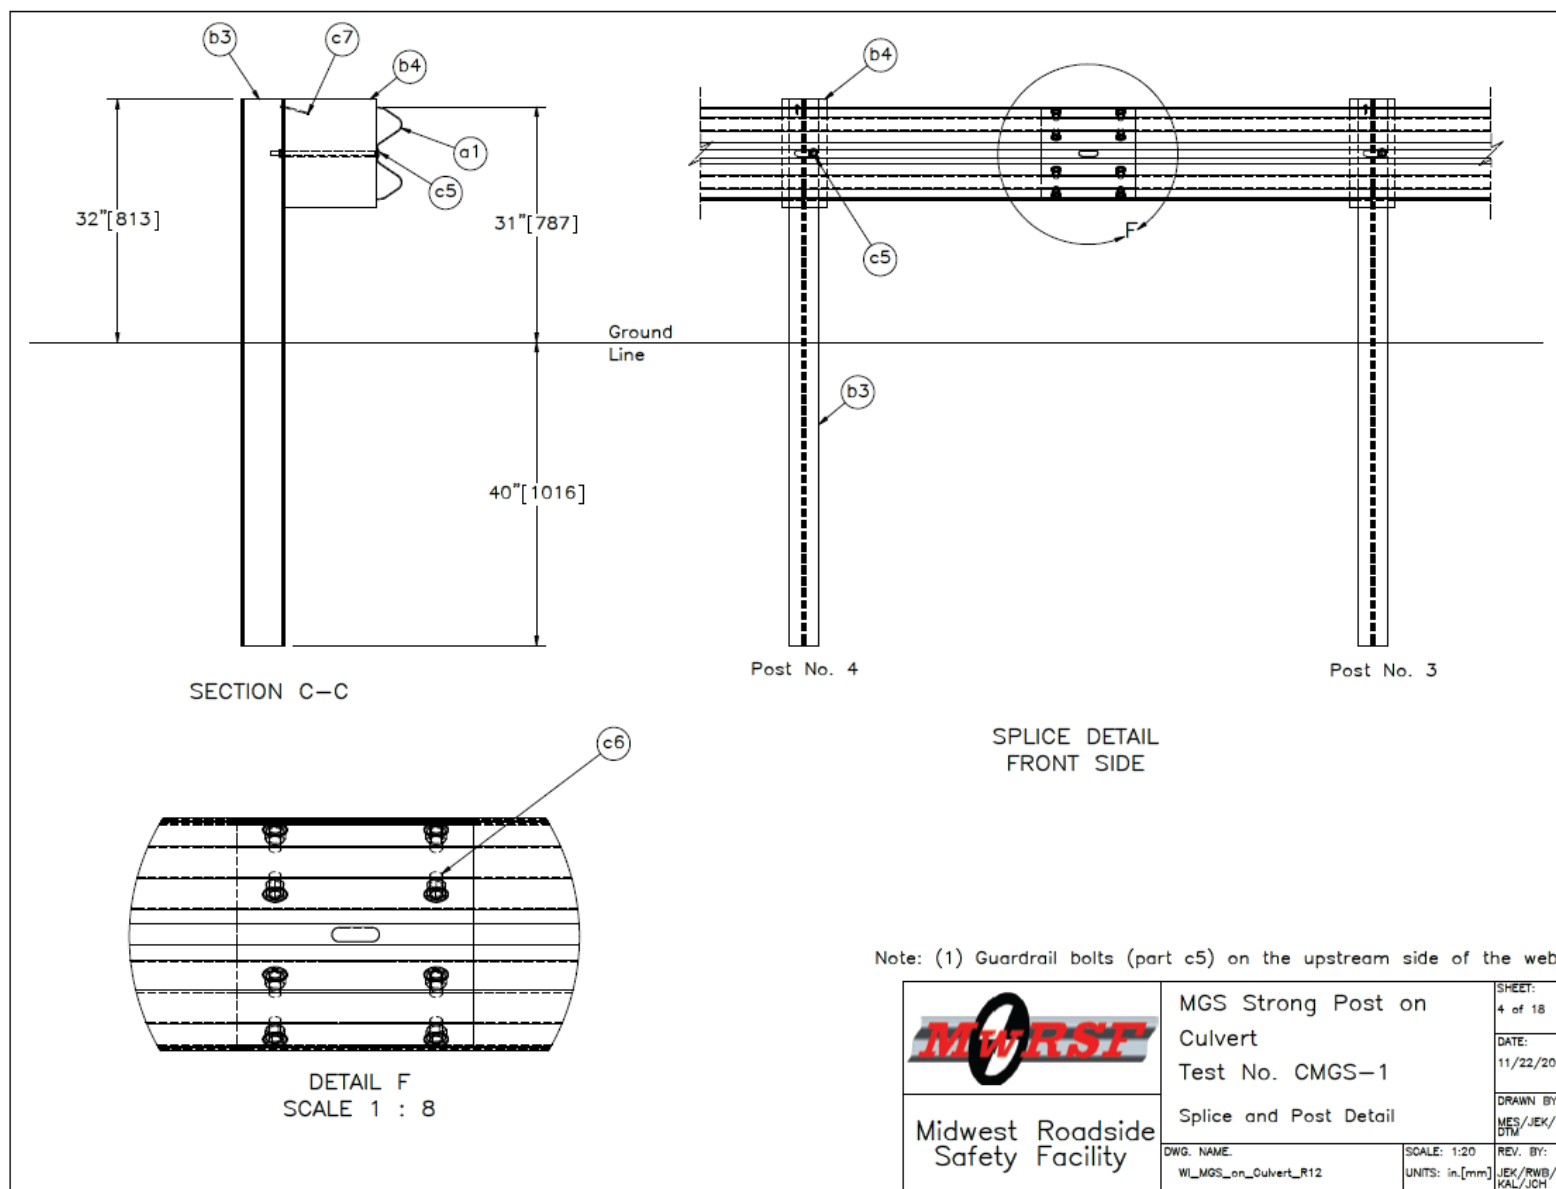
Splice and Post Details, Test Nos. CMGS-1 and CMGS-2
